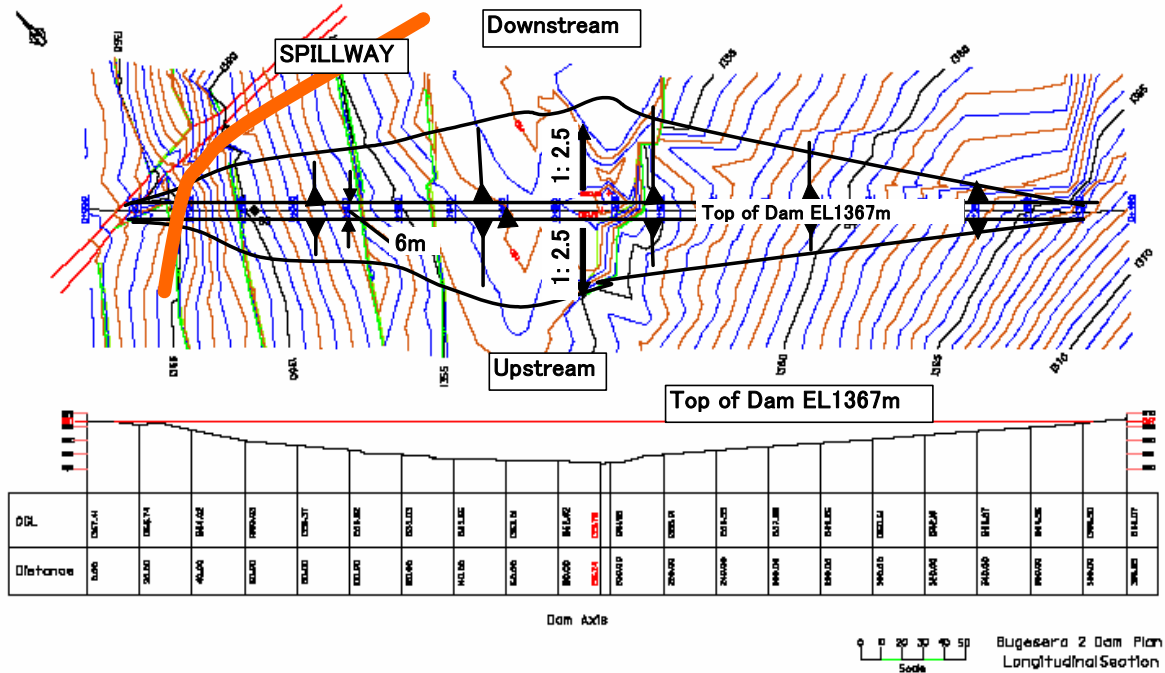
Bugesera2 Longitudinal Section and Plan
